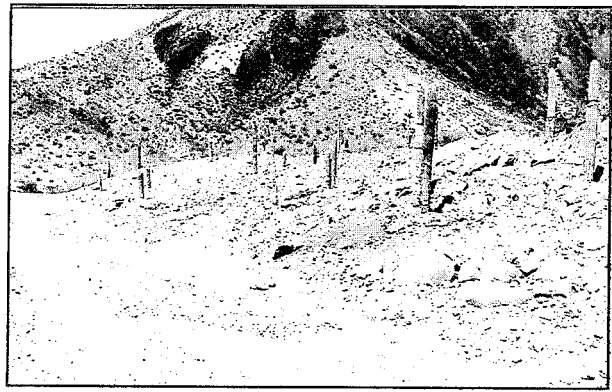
False cut embankment treated with salvaged boulders and vegetation.
